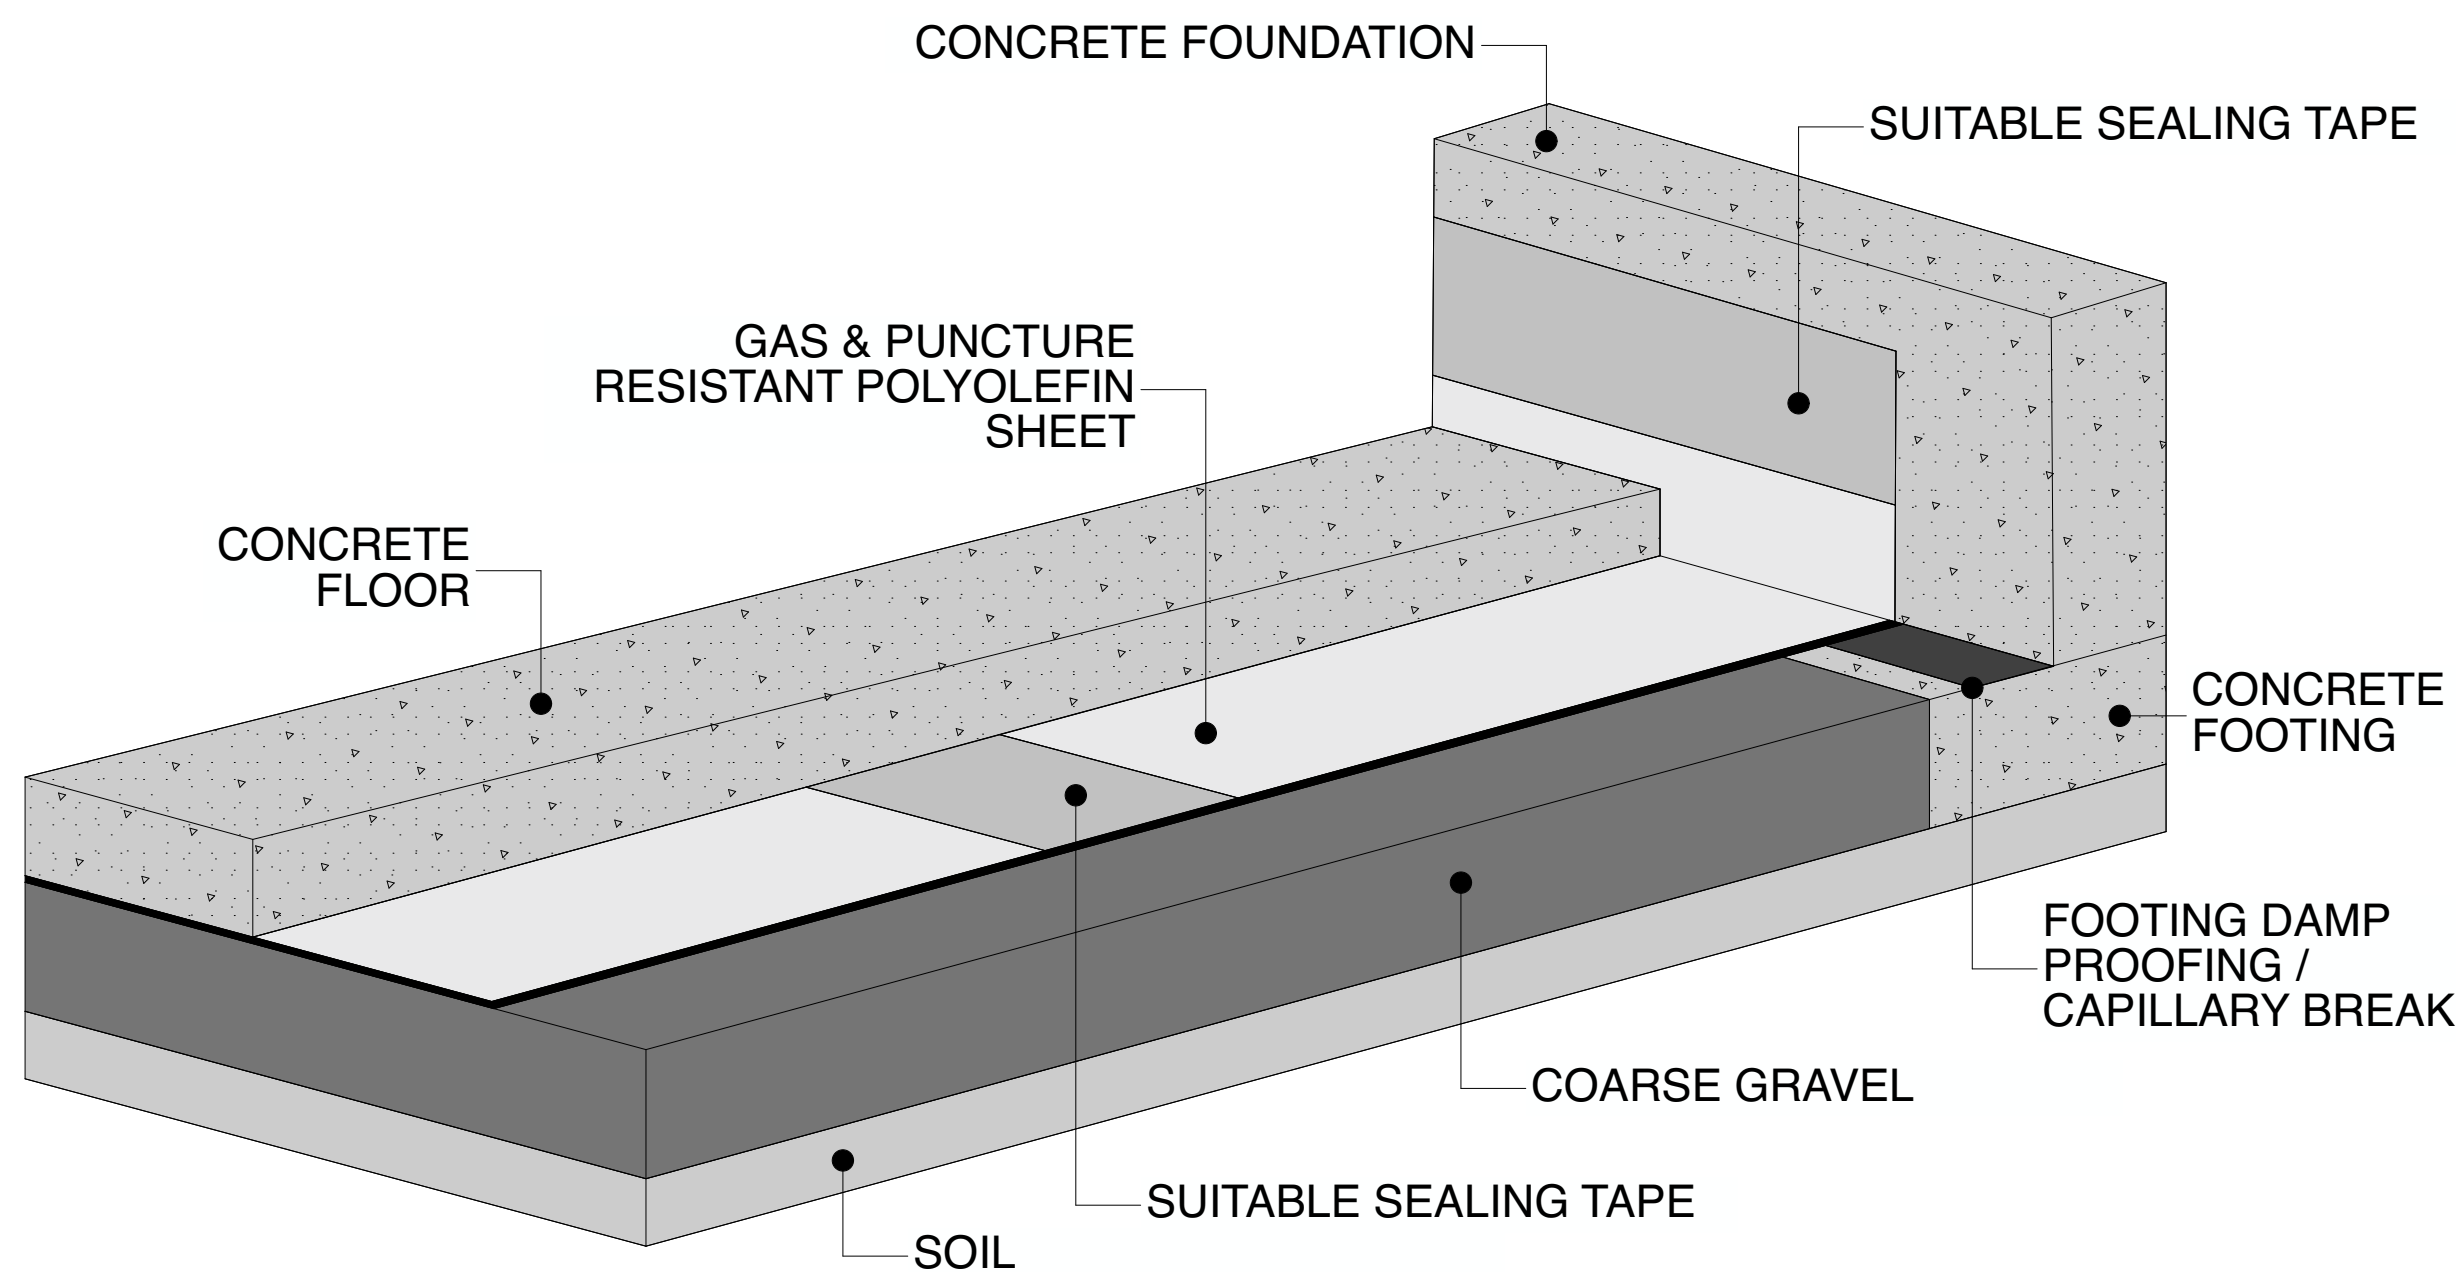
SEALING SUB-SLAB MEMBRANE VERTICALLY TO CONCRETE FOUNDATION WALL
